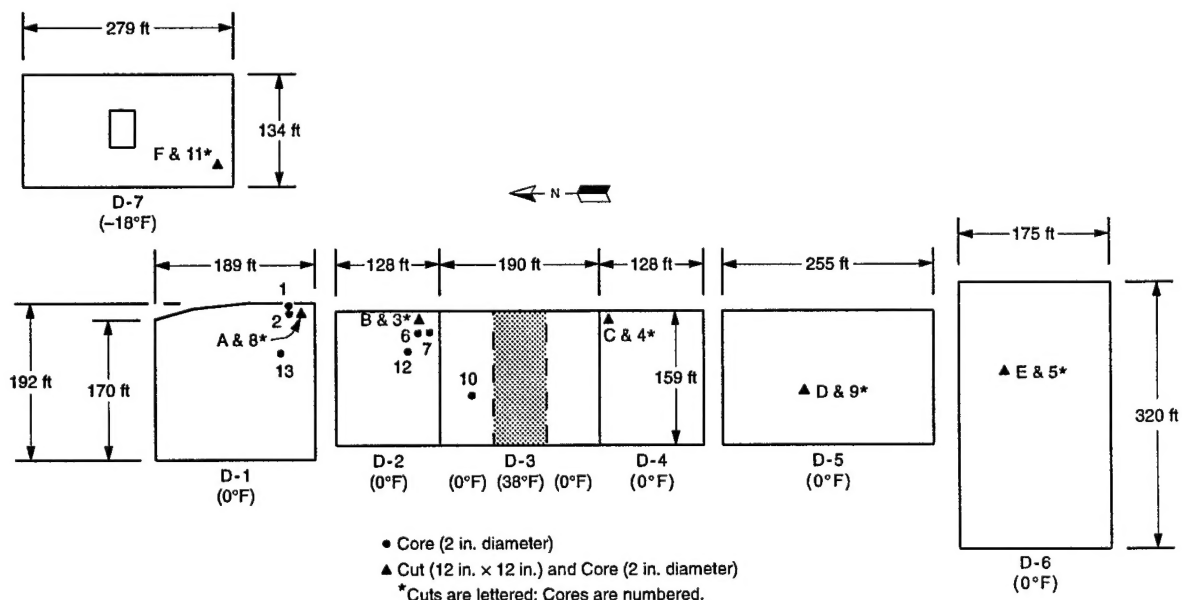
Plan view of the seven roofs examined in Dallas, Texas.
